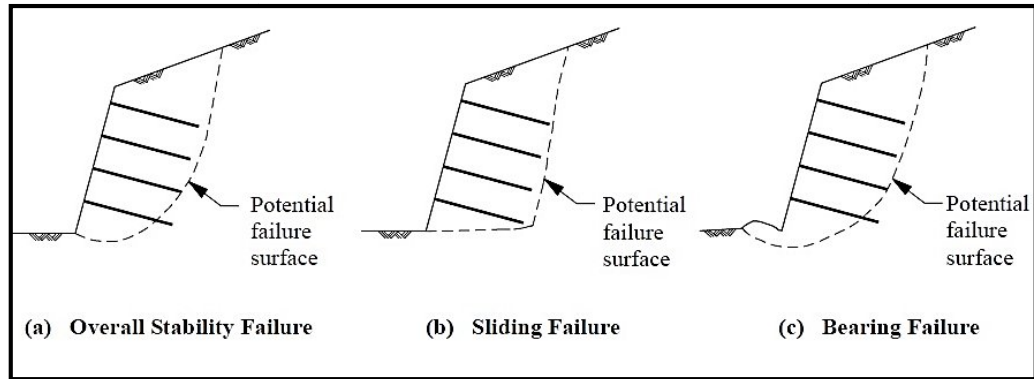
Potential External Failure Modes of a Soil Nail System
